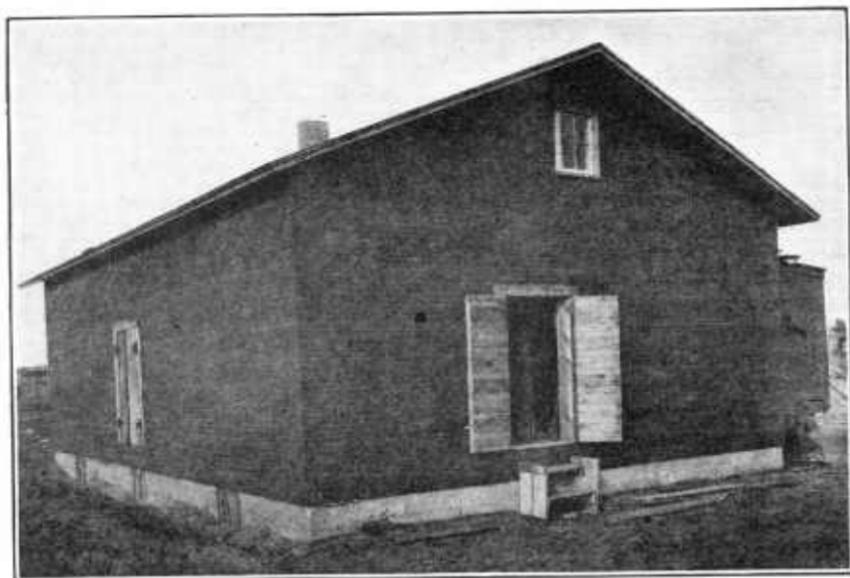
An insulated frame potato-storage house with a cellar. Greenville, Mich.
